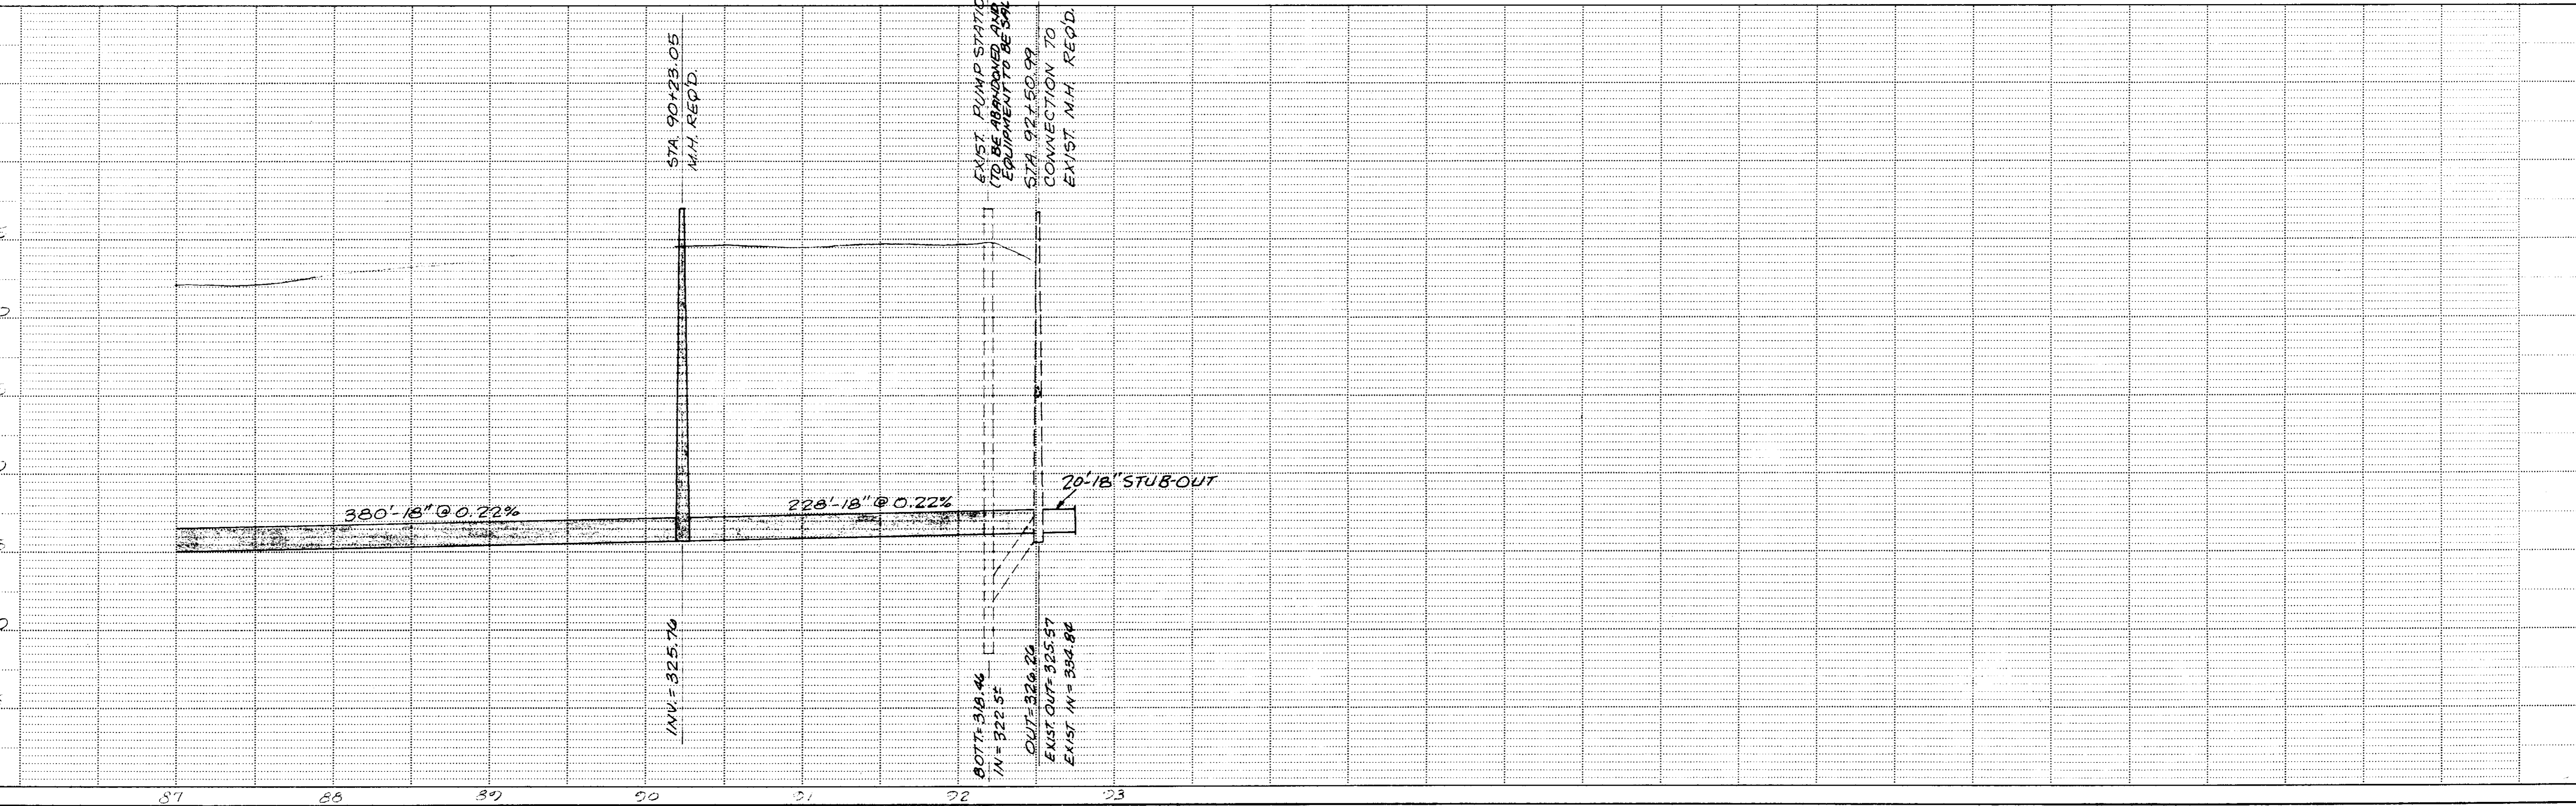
SINGLE PLAN AND PROFILE-FULL DOT
